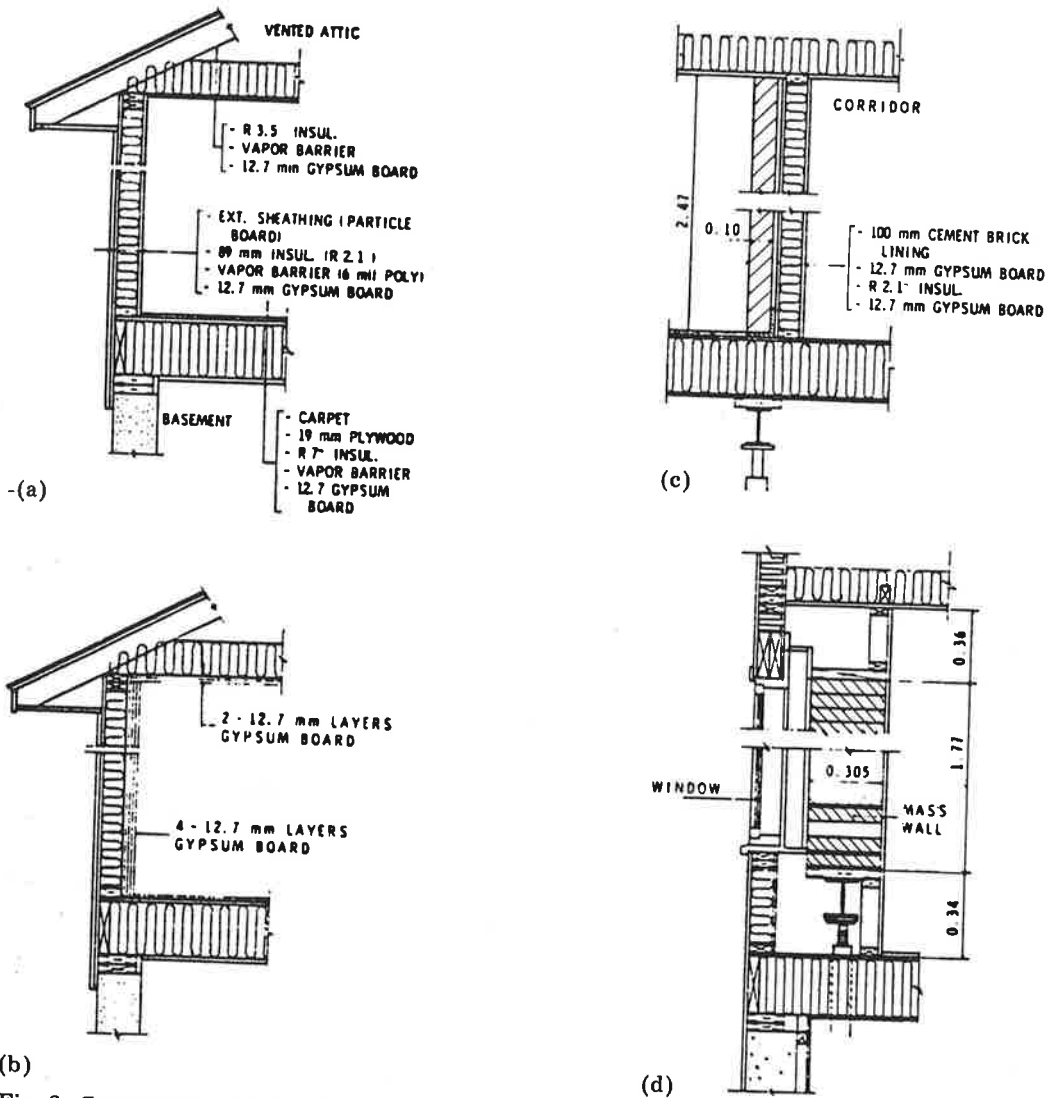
Construction details of test facility. (Thermal resistance values in  $m^2 \text{ } ^\circ\text{C/W}$ ). (a) Wall construction, Unit 1. (b) Wall construction, Unit 2. (c) Wall construction, Unit 3. (d) "Mass-wall" construction, Unit 4 [23].
